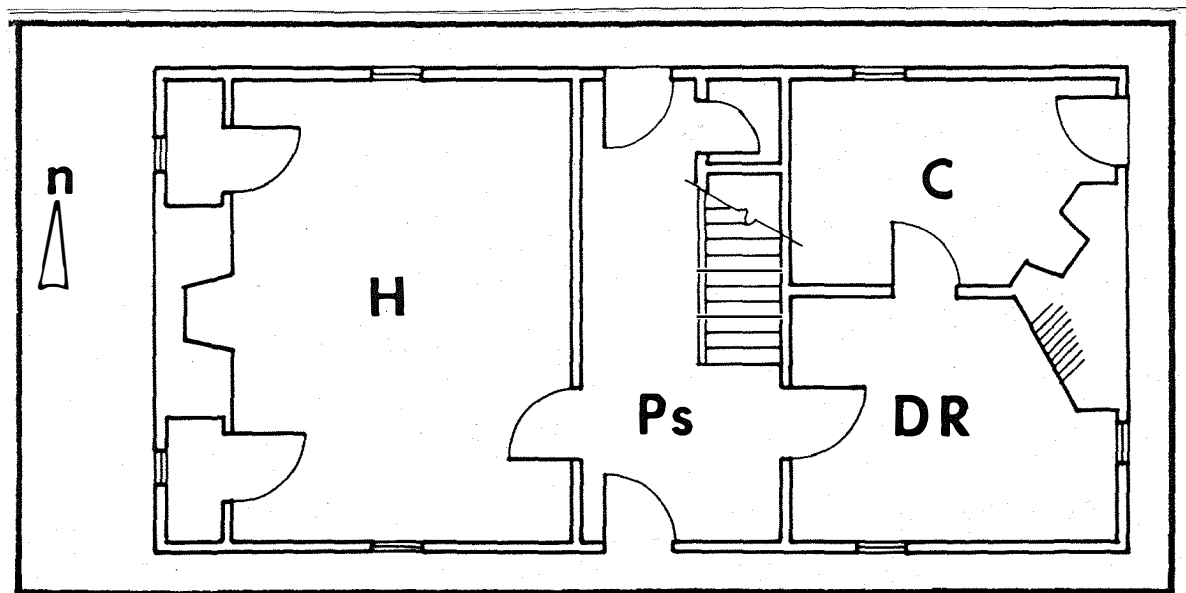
First-floor plan of Billups House, Mathews County (Upton 1986:317).
